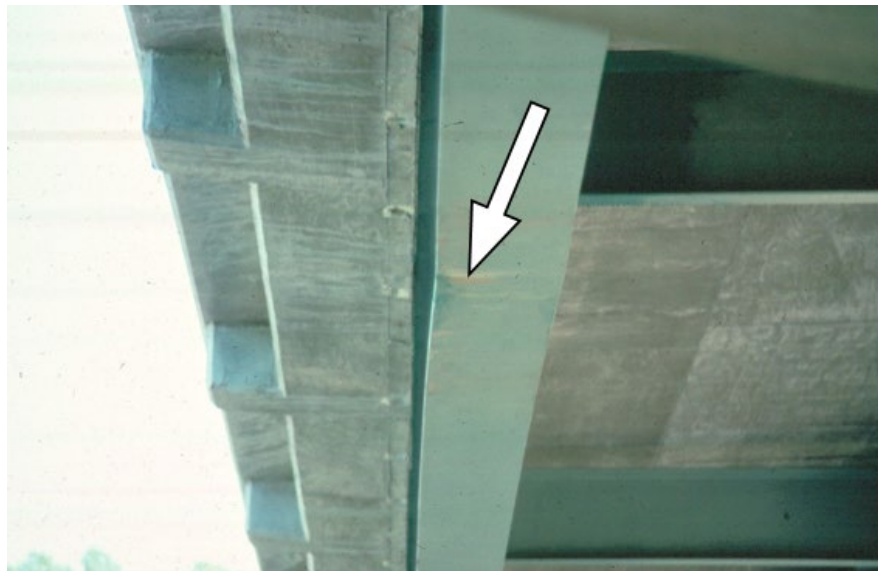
Collision Damage on a Deck Girder Bridge
